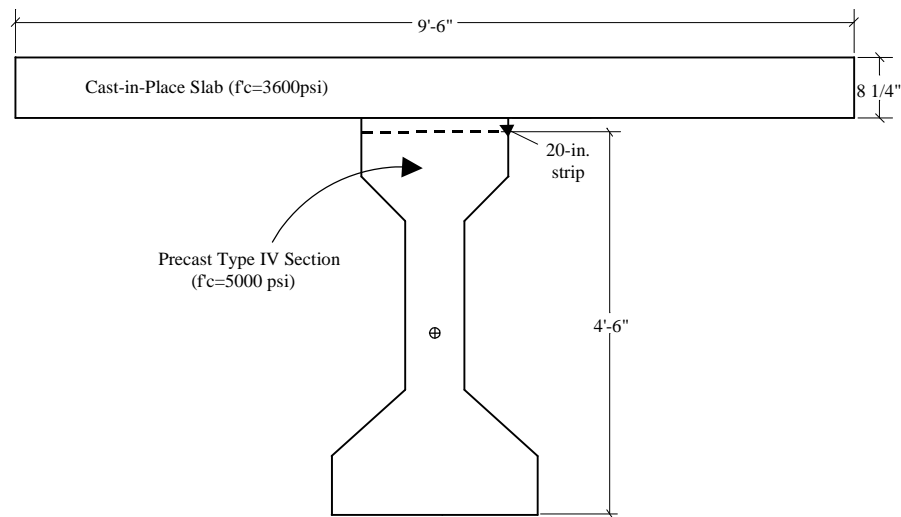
Composite Section for Interior Girder - Nolanville Bridge
